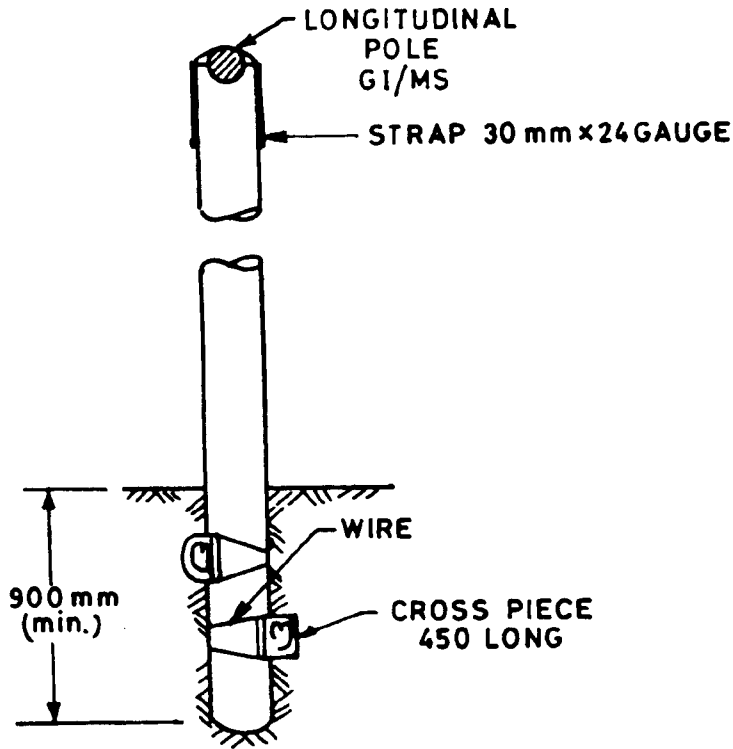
ANCHORAGE TO FOUNDATIONS IN THATCHED BUILDINGS
